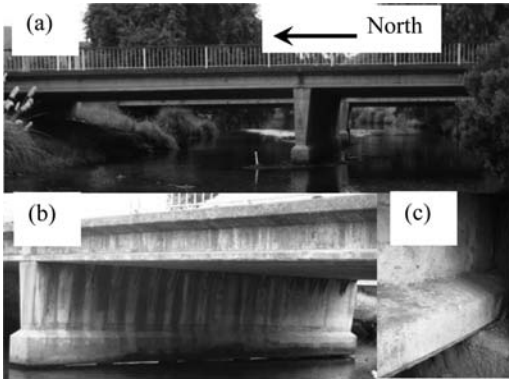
The Fitzgerald Avenue twin bridges: (a) elevation of the west bridge; (b) illustration of the central pier and pile cap; and (c) seating connection of bridge deck on abutments.
